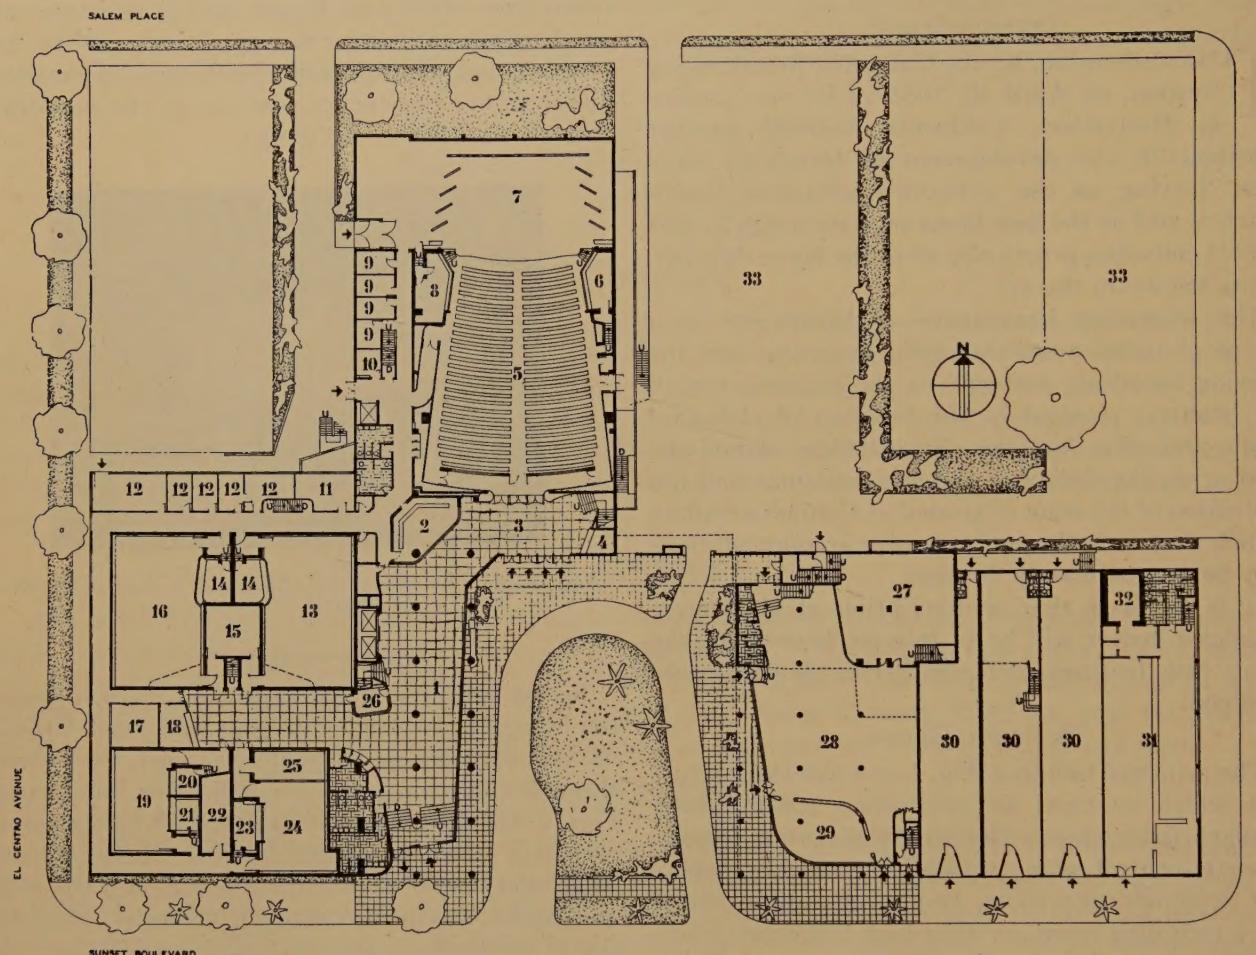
First-floor plan of CBS Hollywood studio building showing auditorium studio, larger studio units, master-control room, offices, and business-building arrangement.
